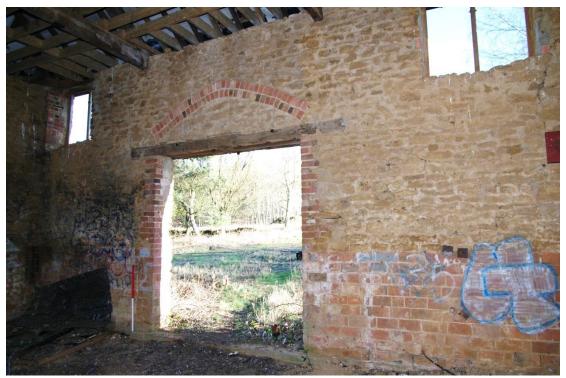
Old Barn, inside of east wall Looking north-east. 1m scale
